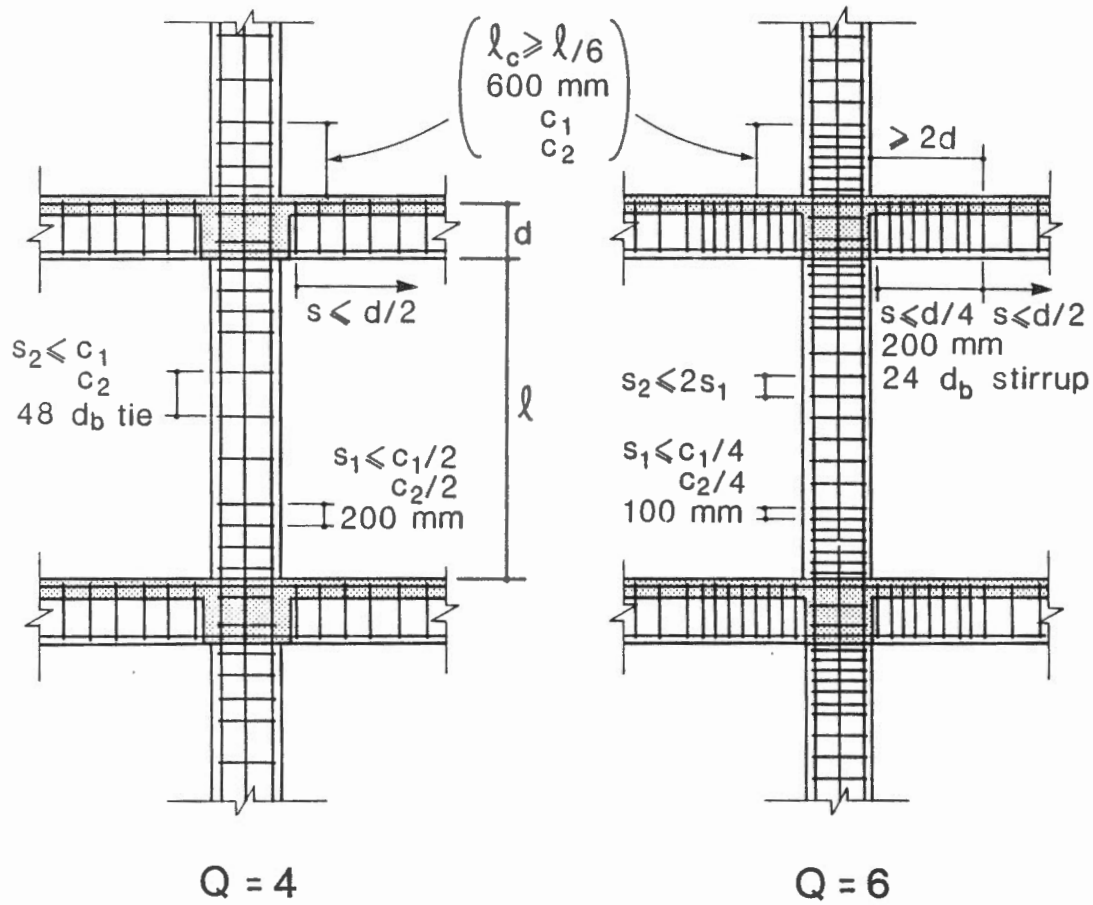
Detailing of Beams and Columns for Different Ductility Factors,  $Q$
